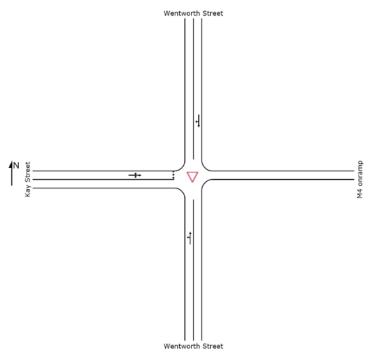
Proposed intersection of Wentworth Street/Kay Street
